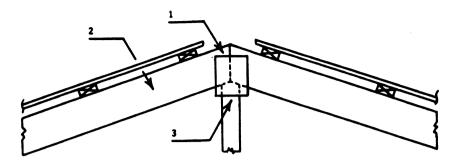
Location of test sites, Barn D. Truss No. 1, 7.3m (24') from west end. East elevation. Molded flashing not
